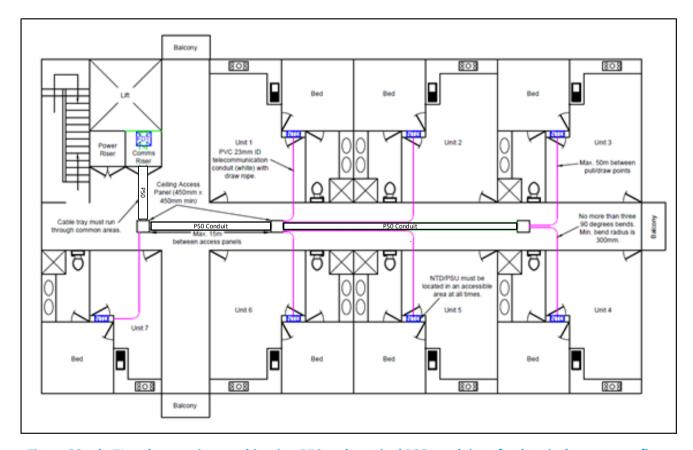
nbn™ pathway using combination P50 and nominal P20 conduit to feed typical apartment floor (example layout 2)
